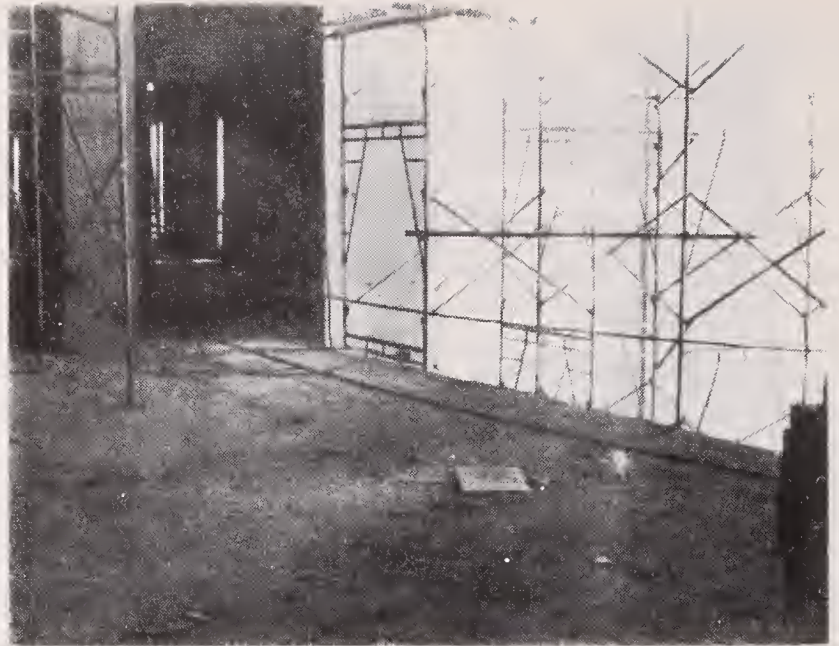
Temporary guardrails around storage area used during construction of multi-story building.
